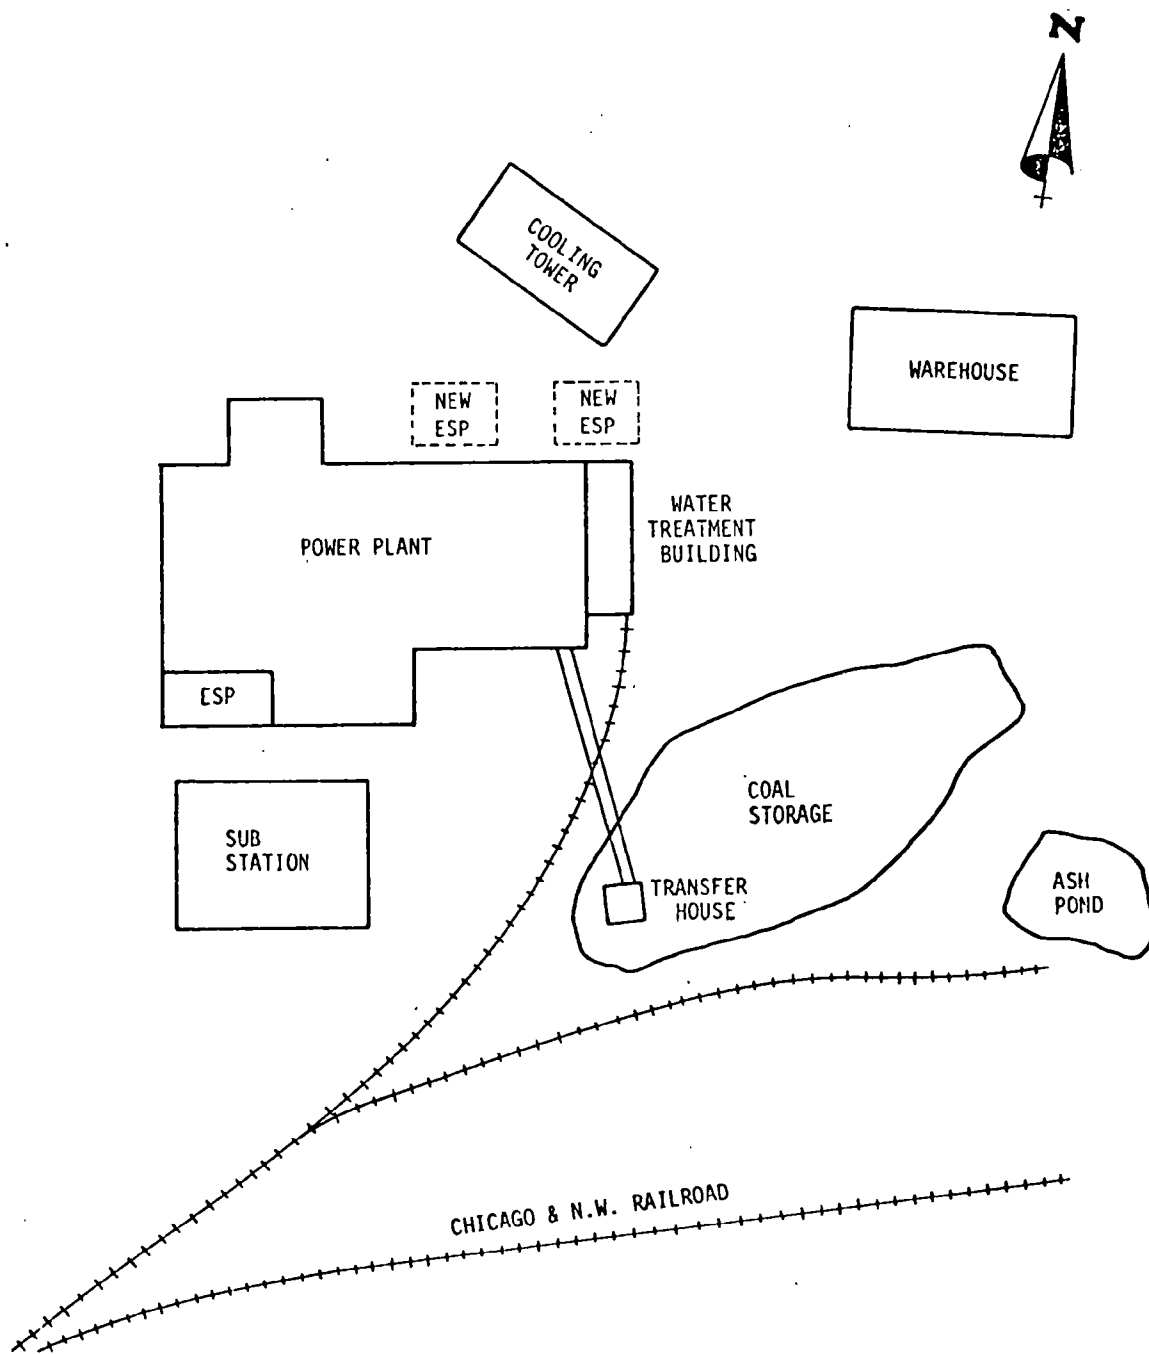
Site plan showing possible locations of new ESP's for Boilers 6 and 7 at the L.D. Wright power plant.
